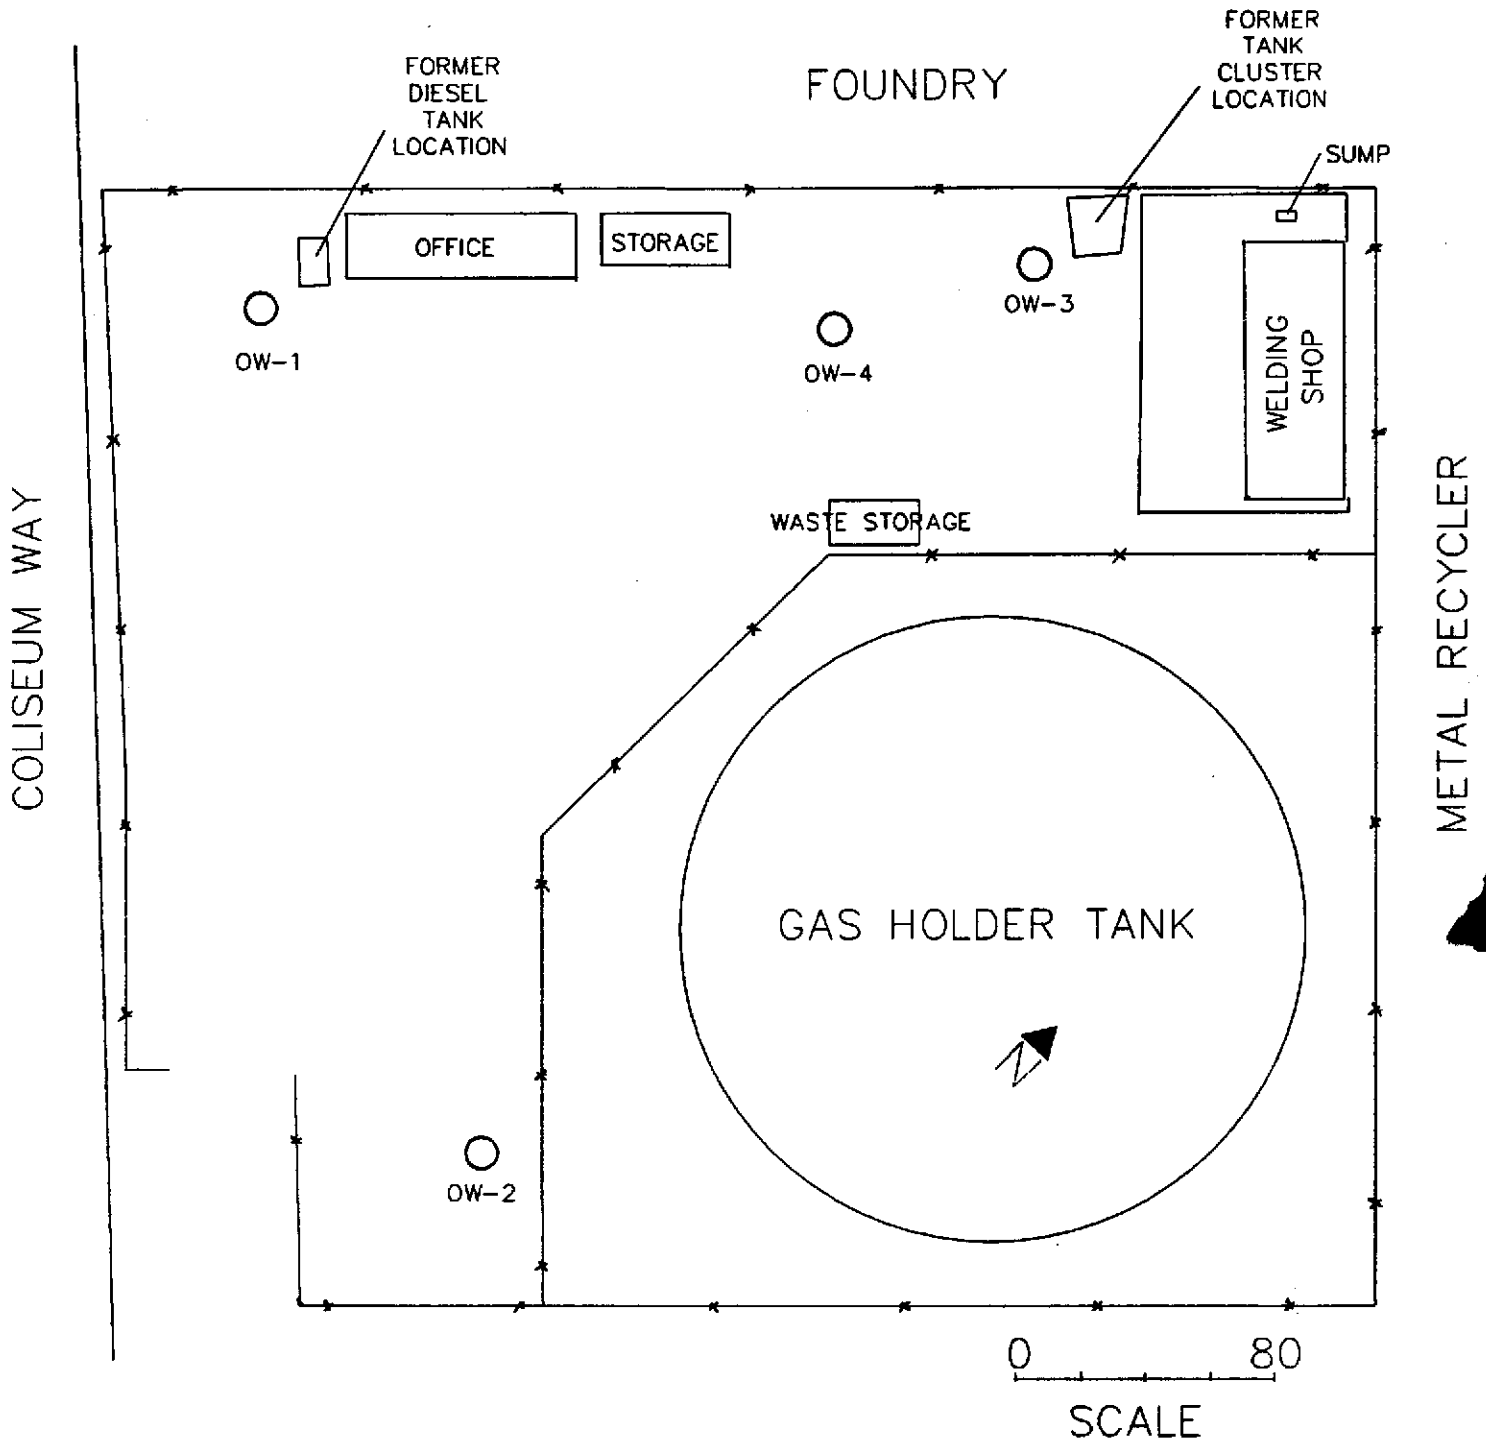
SITE PLAN AND MONITOR WELL LOCATIONS
